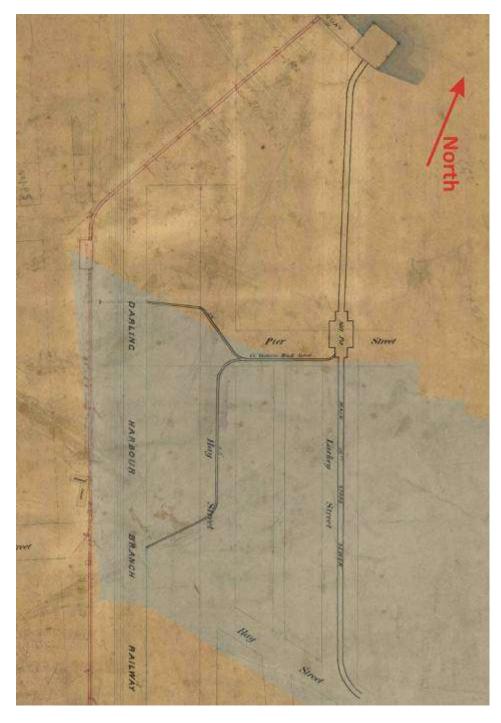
Plan of the Lackey Street branch of the Hay Street stone sewer in 1880. The channel outlet is located under a pier of the Iron Wharf. OCP 276, 23 Sep 1880, Sydney Water.
